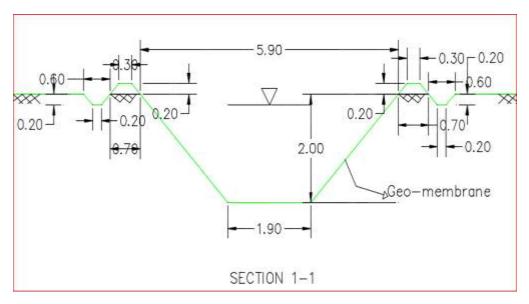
Plan & section of underground roof water harvesting HH pond lined with Geo-membrane
